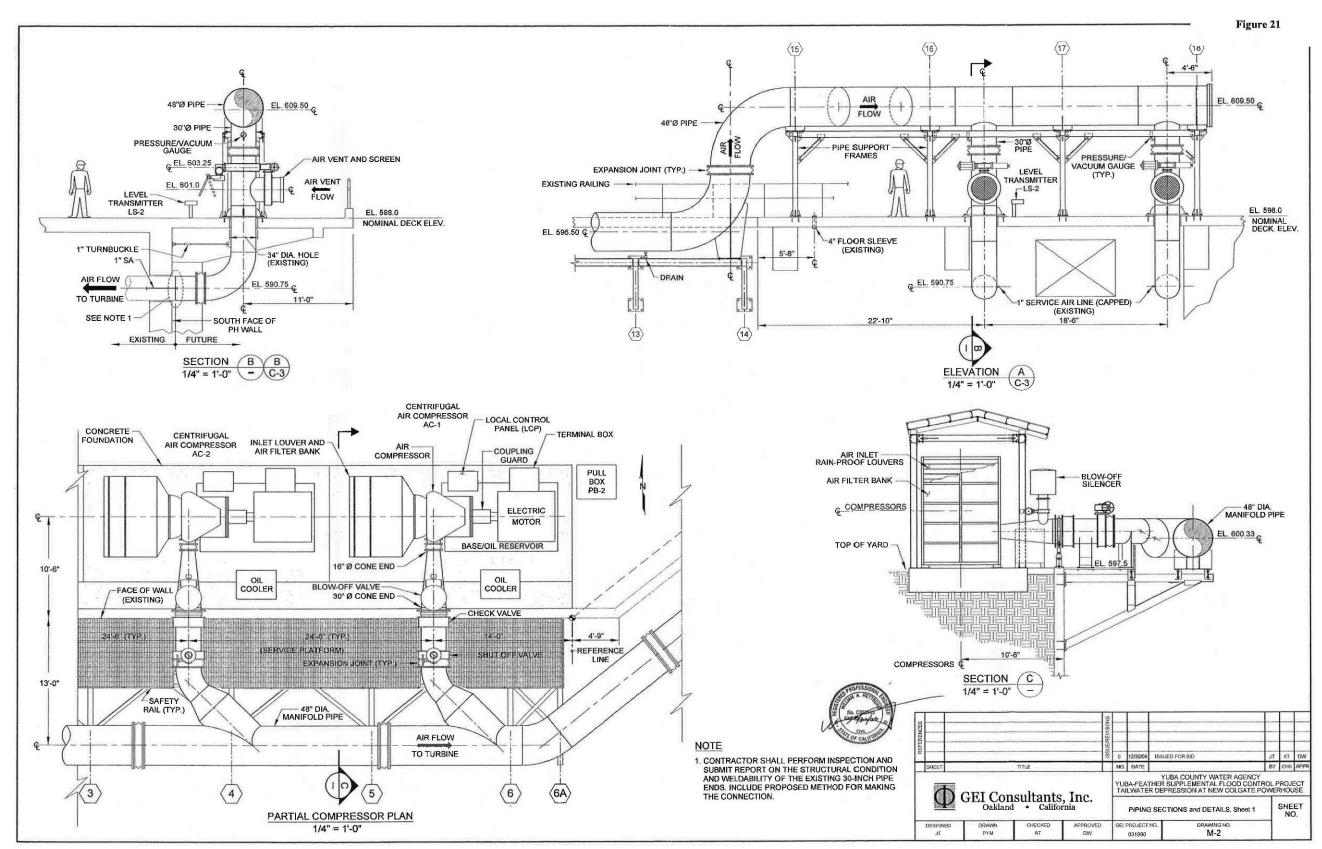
Conceptual level plan for piping section and details of YCWA's proposed New Colgate Powerhouse Tailwater Depression System.
